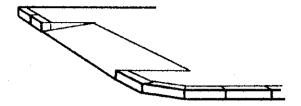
Layout of Improvement for Kerbstone on Sidewalk
